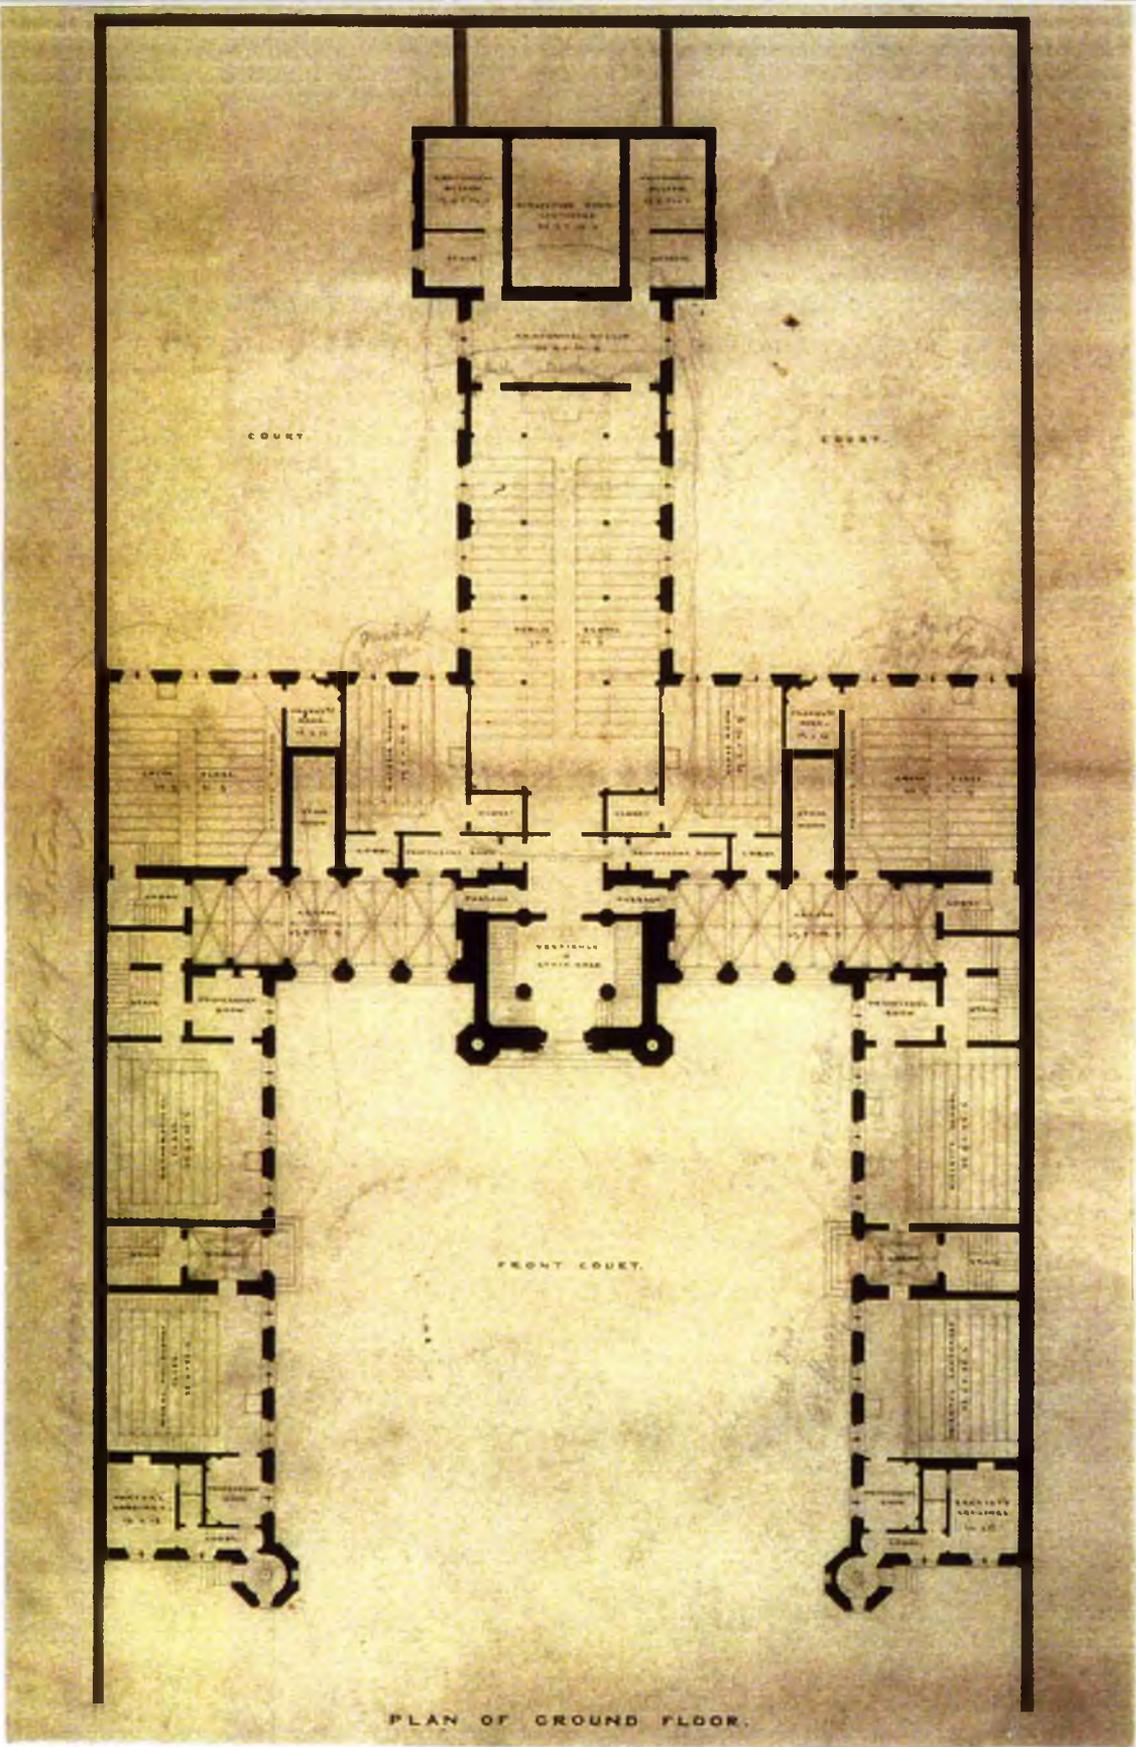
Marischal College. Ground floor plan. A. Simpson, June, 1836.
